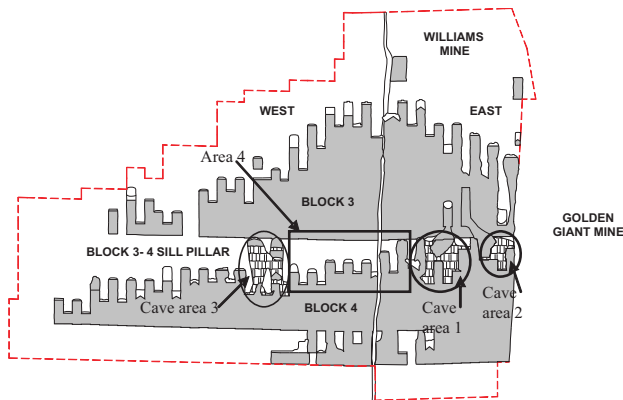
Longitudinal of B-Zone looking north (LeBlanc and Murdock, 2000).
